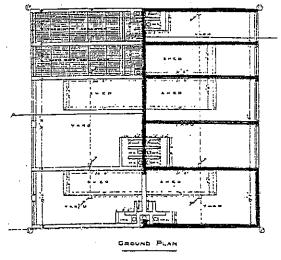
Floor plan of the Special Yards based on an early plan c. 1925 (PC 321/1).
